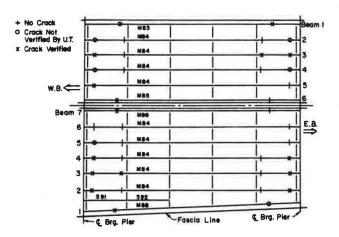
Plan of inspected details in span 10 Yellow Mill Pond Bridge
